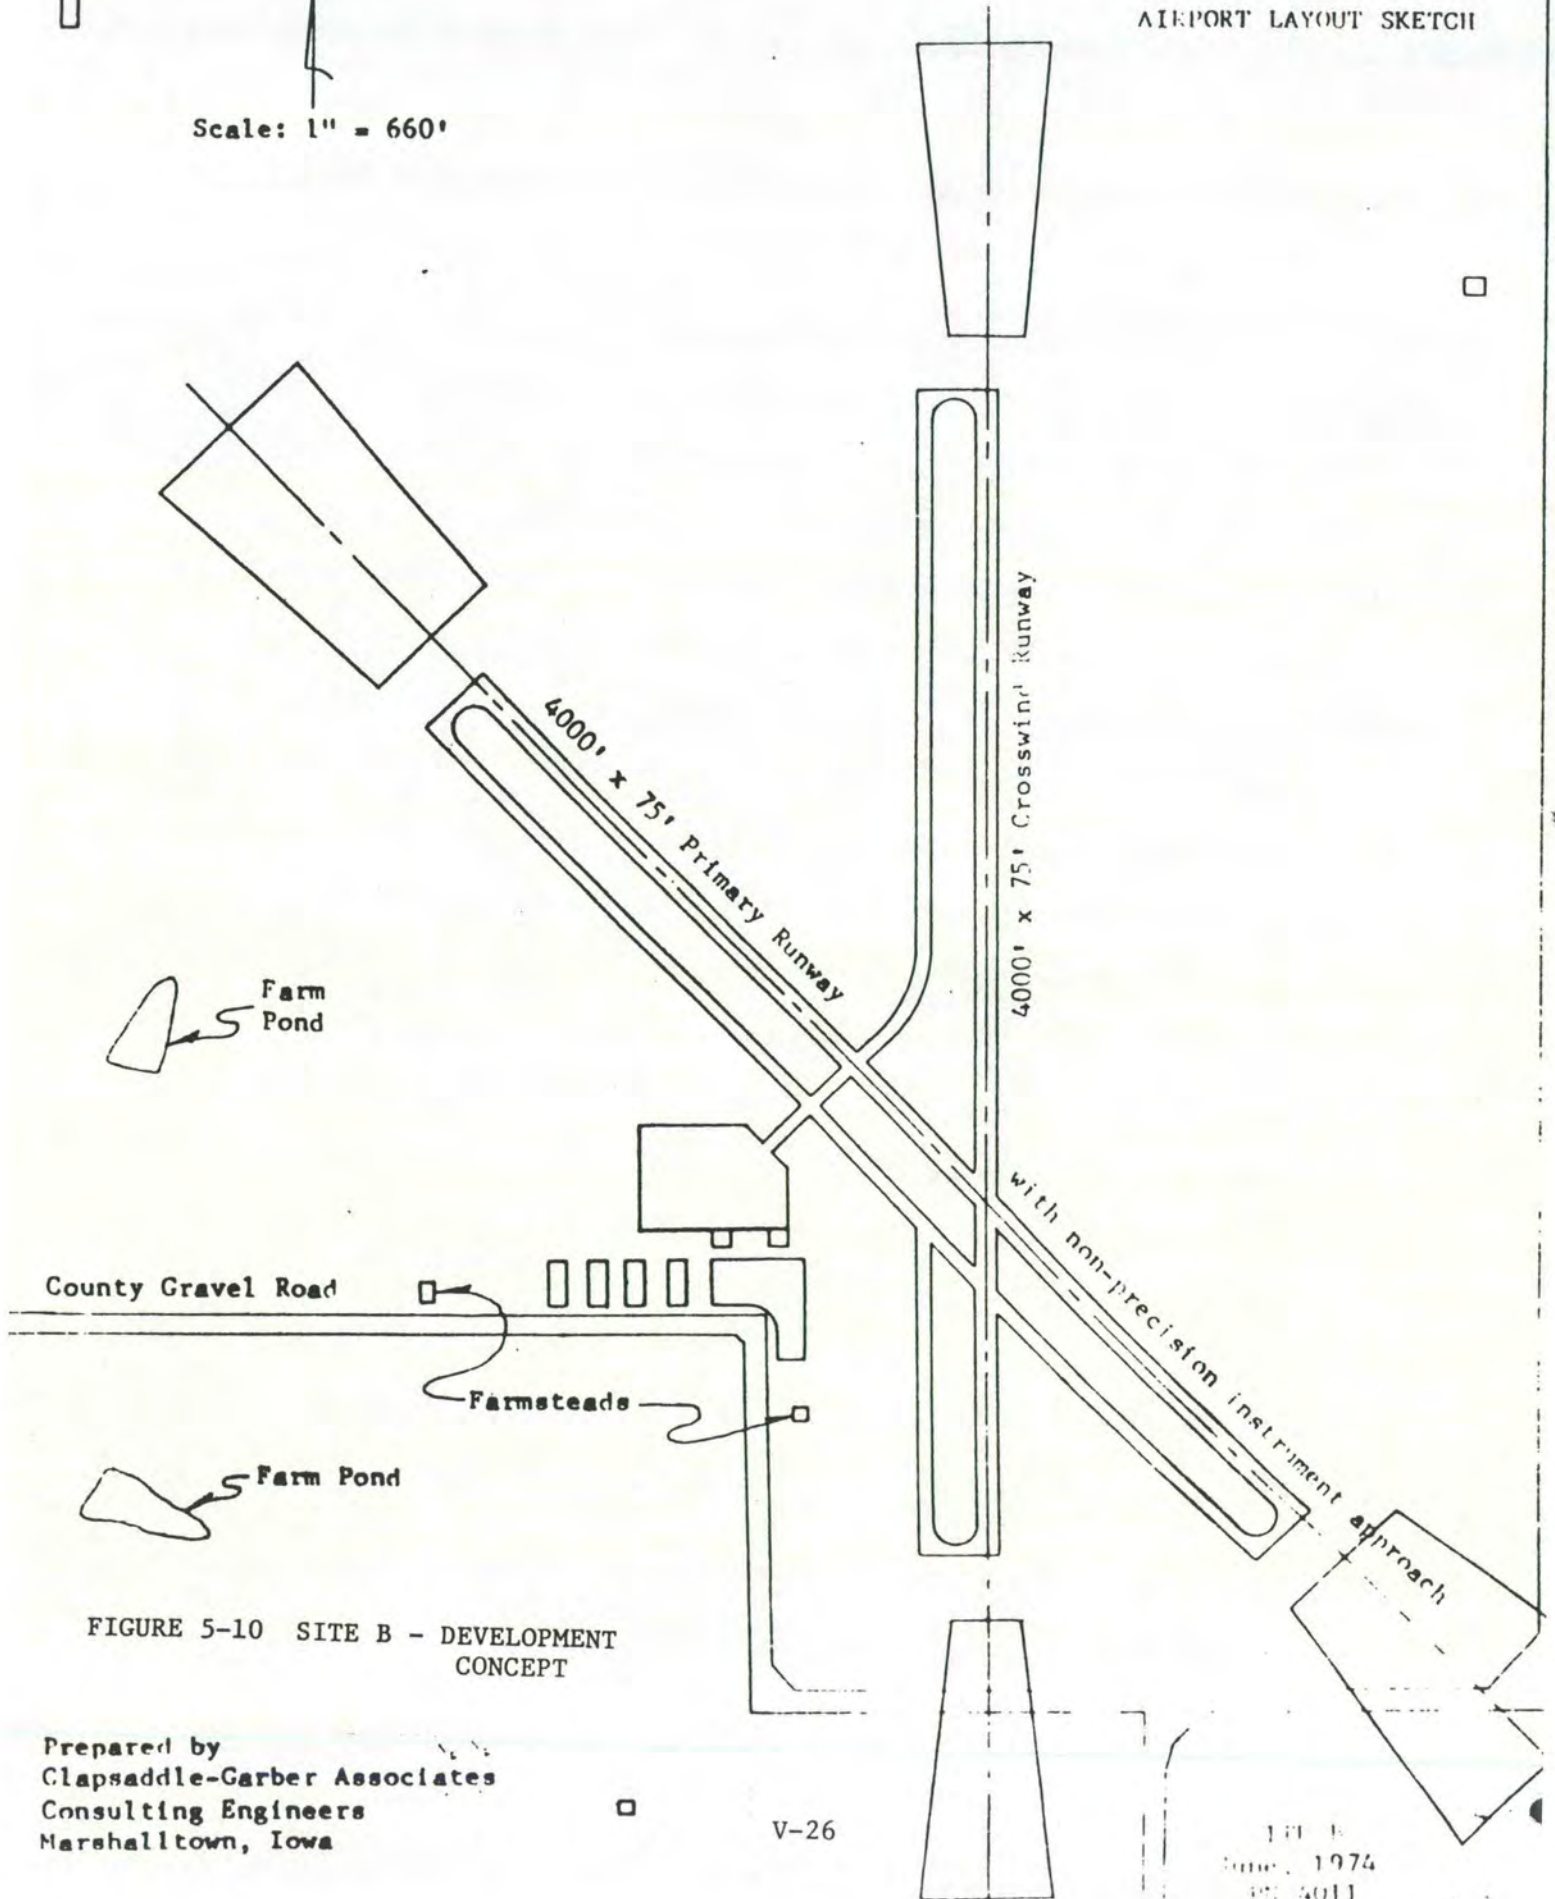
SITE B - DEVELOPMENT CONCEPT
